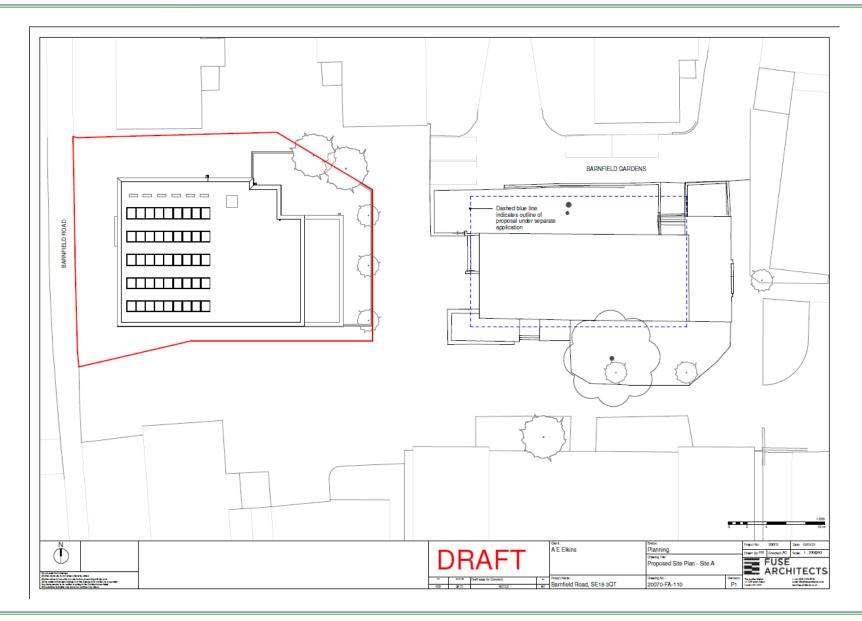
Site A Proposed site plan (Reproduced by courtesy of the client)
